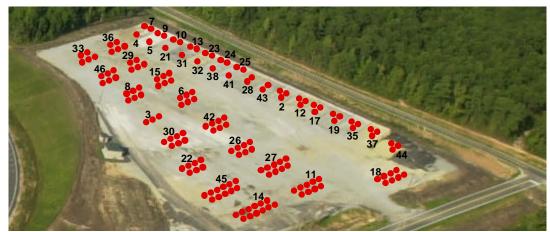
Stockpile Staging Plan on Prepared Track Plant Site
